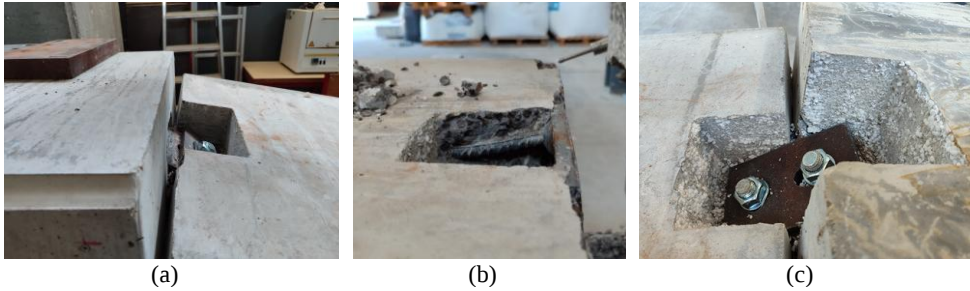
Crack pattern: (a) Connection-1; (b) Connection-2 and (c) Connection-3.
